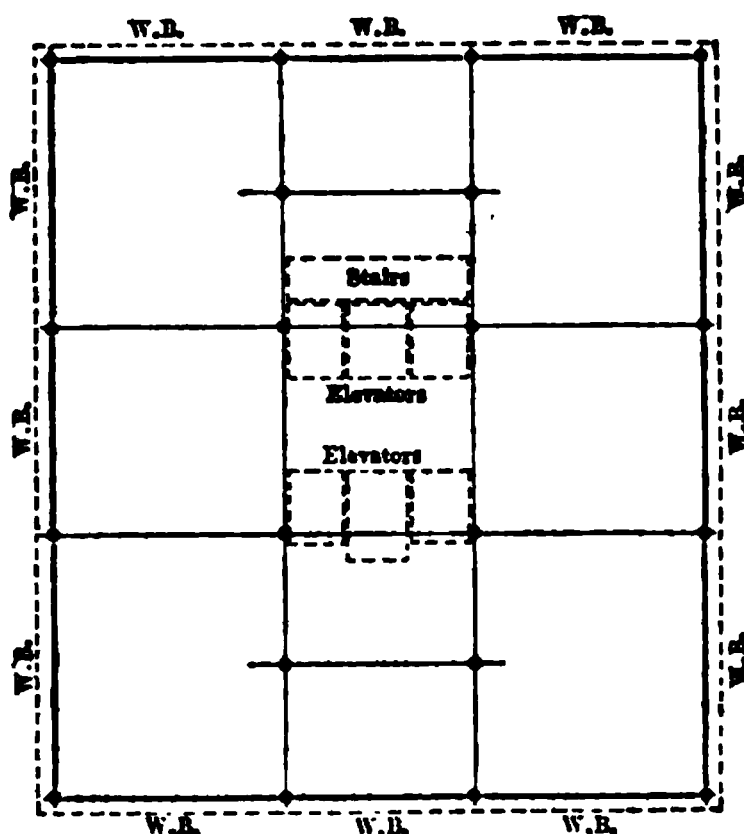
Metropolitan Tower. Plan and Lines of Bracing
